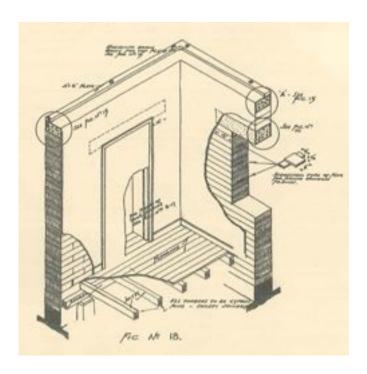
Typical construction for earth building showing continuous concrete ring beam capping the top of walls. Homes of Earth (c195-?), Qld Housing Commision; Fig 18, p7
